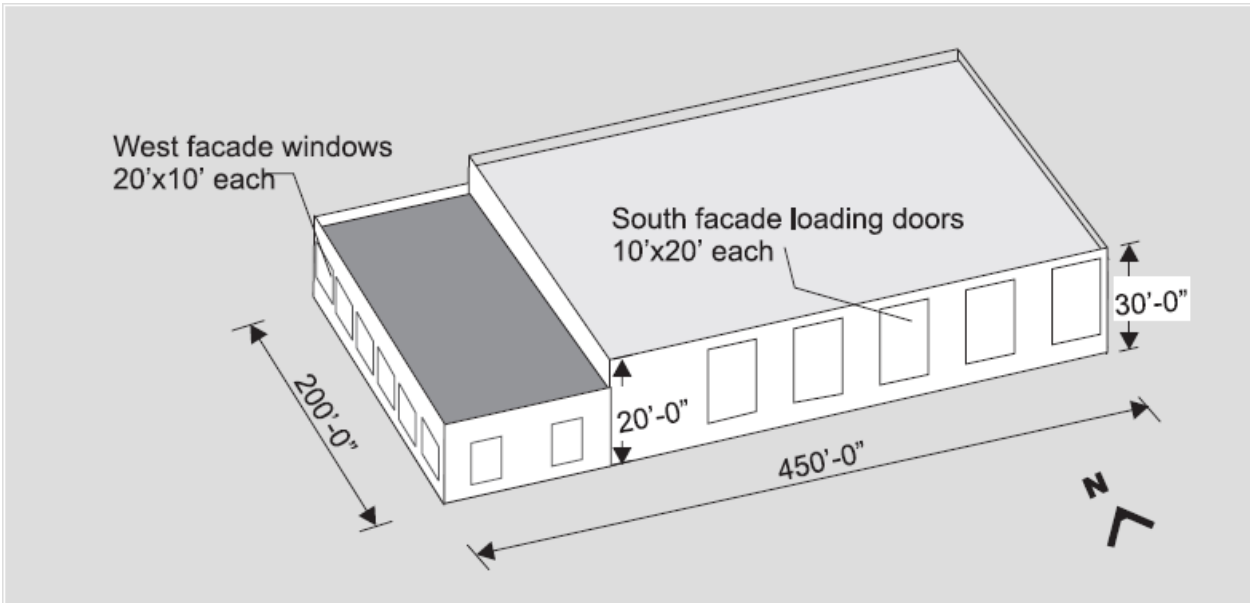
Envelope Trade-Off Option Test Building (Source: ASHRAE 90.1-2007 User's Manual)
